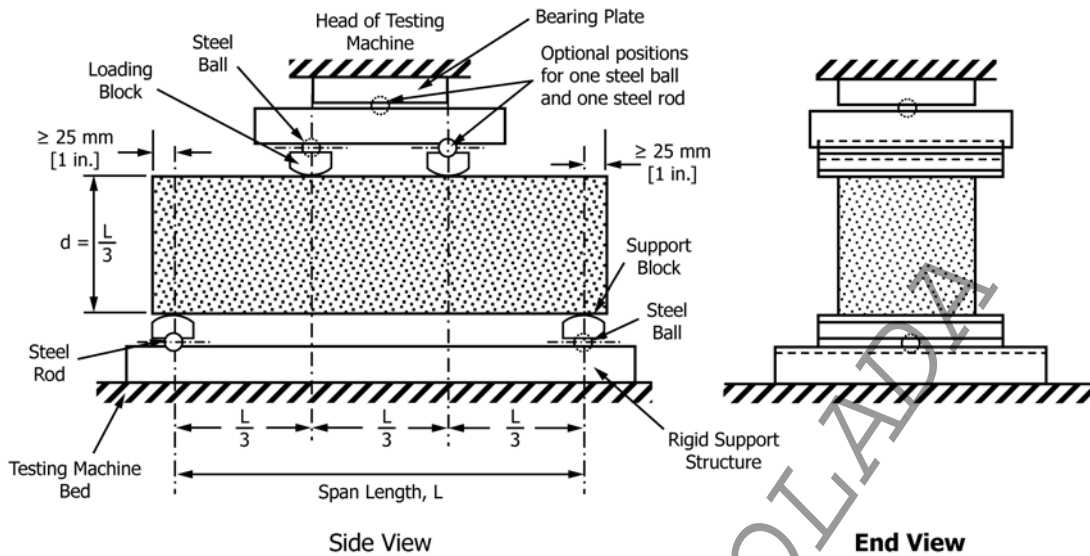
Schematic of Flexural Testing Apparatus for Third-Point Loading Method
